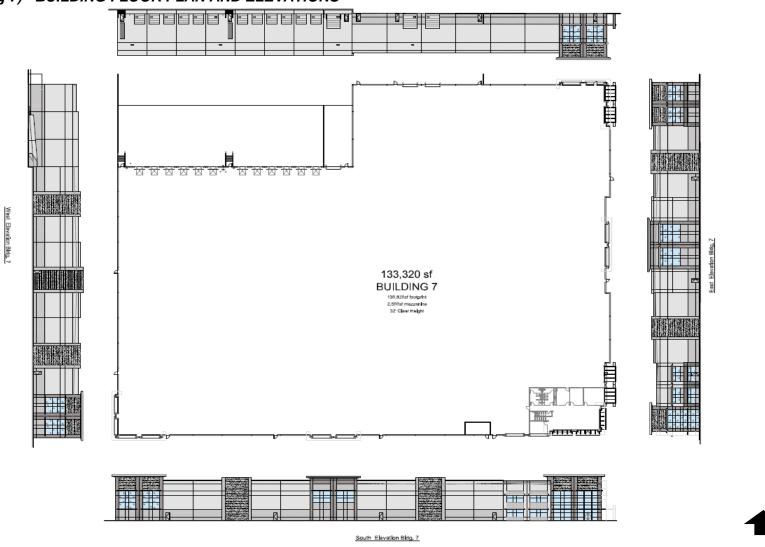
Exhibit L (Building 7) - BUILDING FLOOR PLAN AND ELEVATIONS
